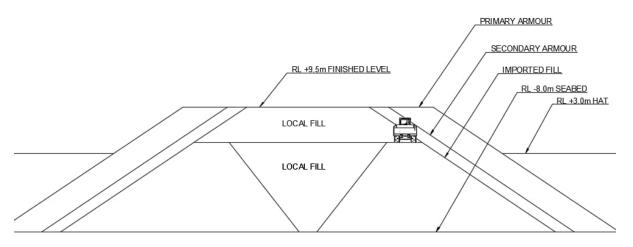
Assumed cross section of rock wharf illustrating proposed construction methodology
